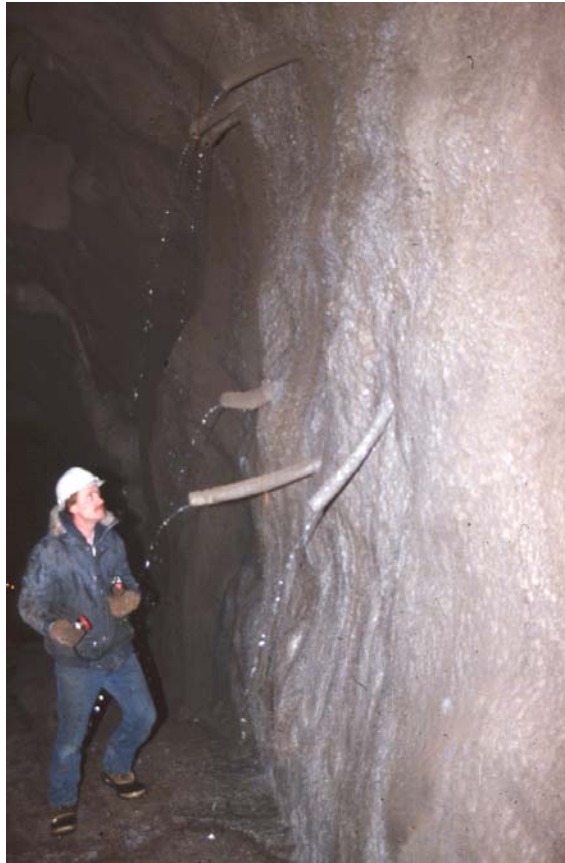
Plastic pipes used to provide drainage for a shotcrete layer applied to a rock mass with water-bearing joints.
